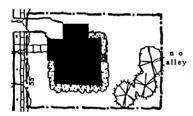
A.4.a Garage Setbacks/No Alley
